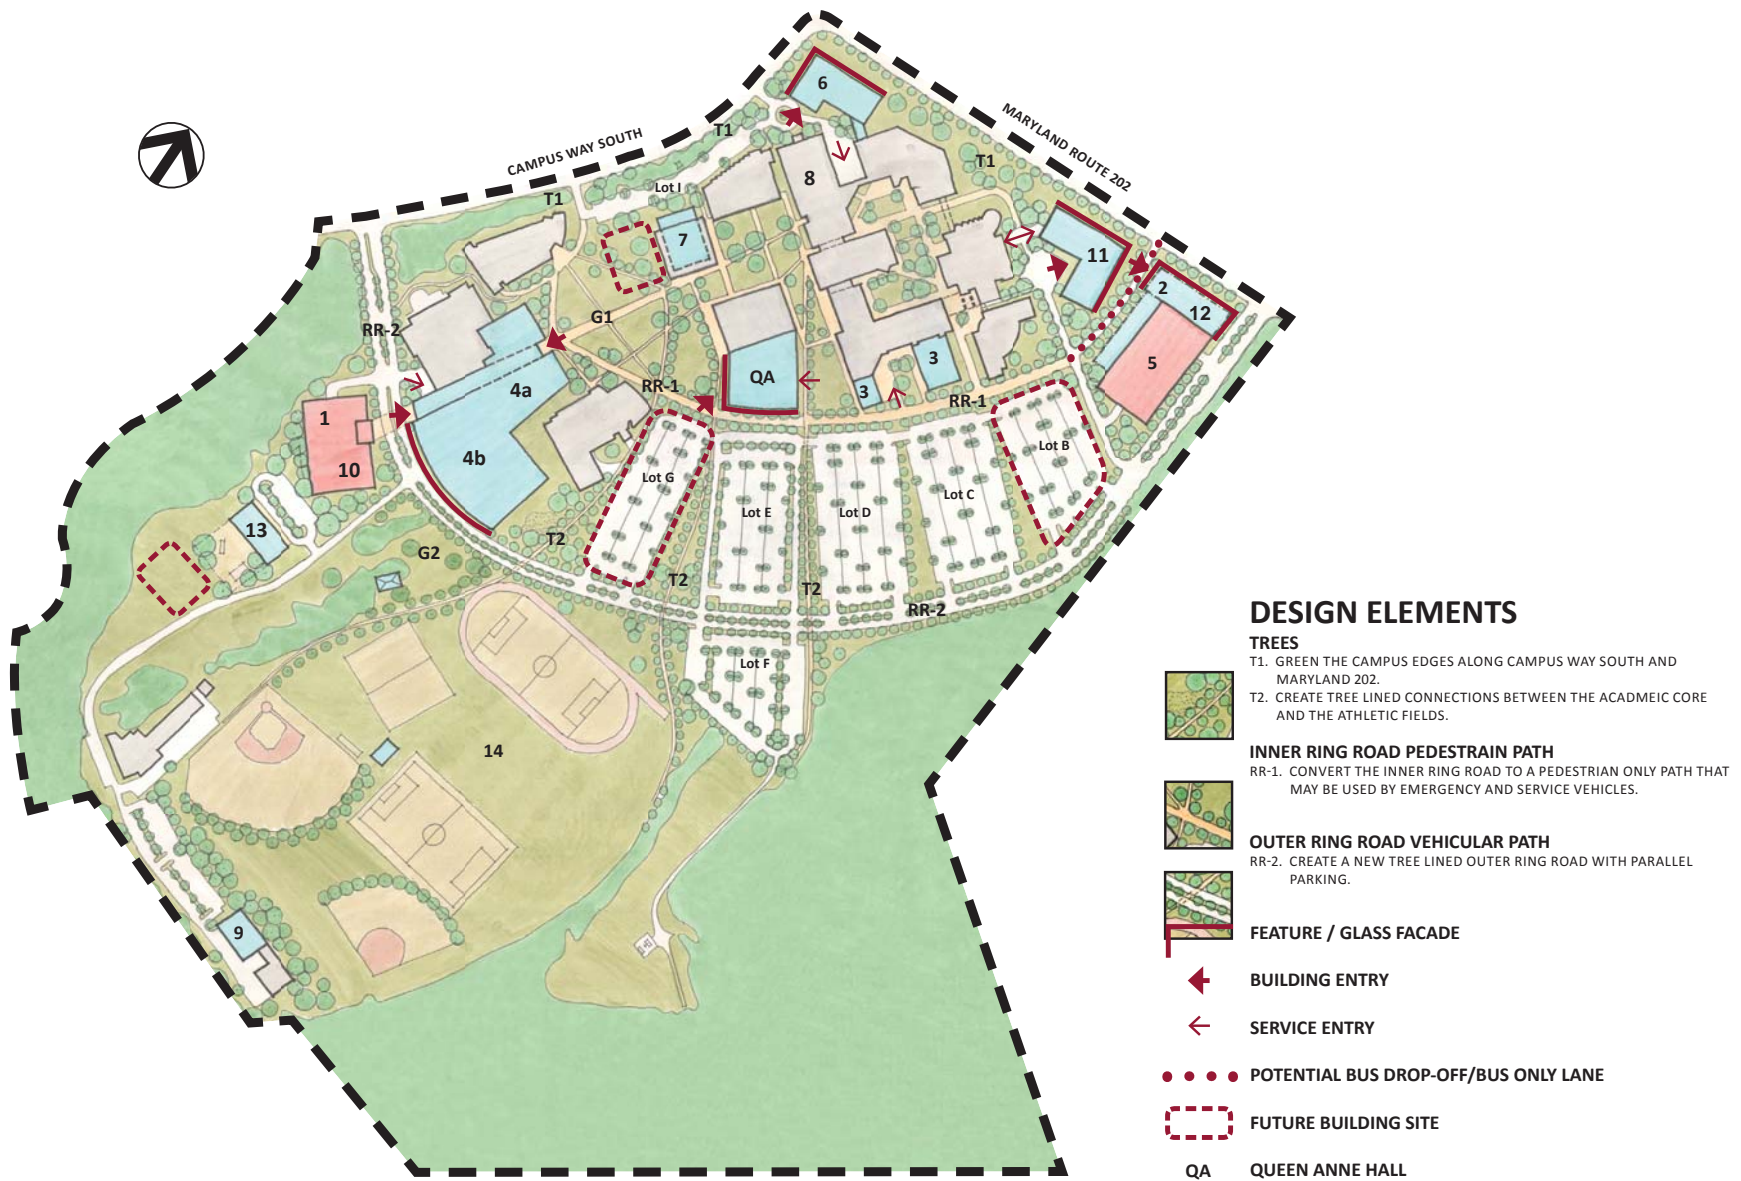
Largo Campus Illustrative Facilities Master Plan - Design Elements
